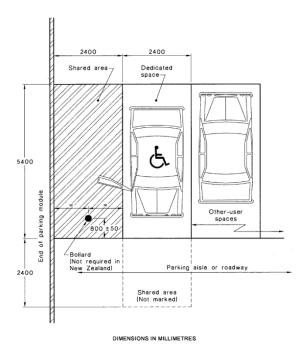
Disabled Parking Space Dimension Requirements (AS2890.6)
